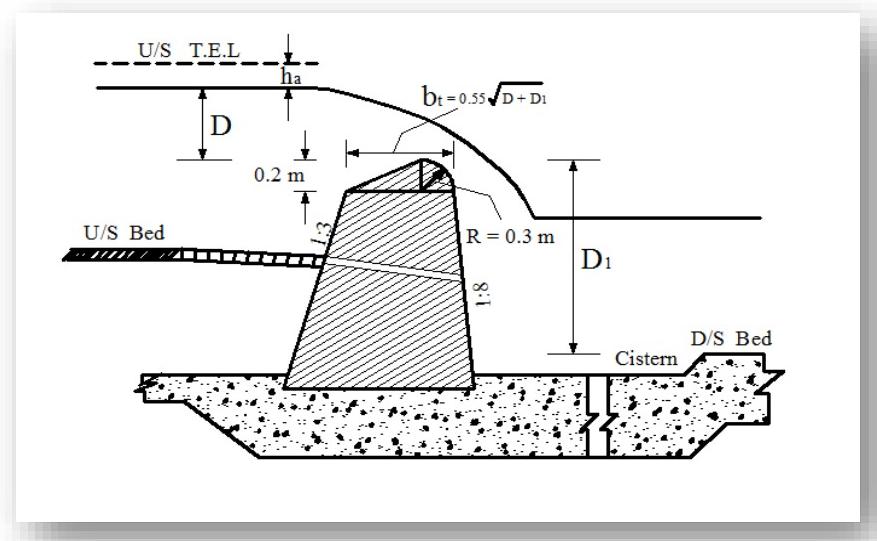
Trapezoidal Crest – Sarda Type Fall
